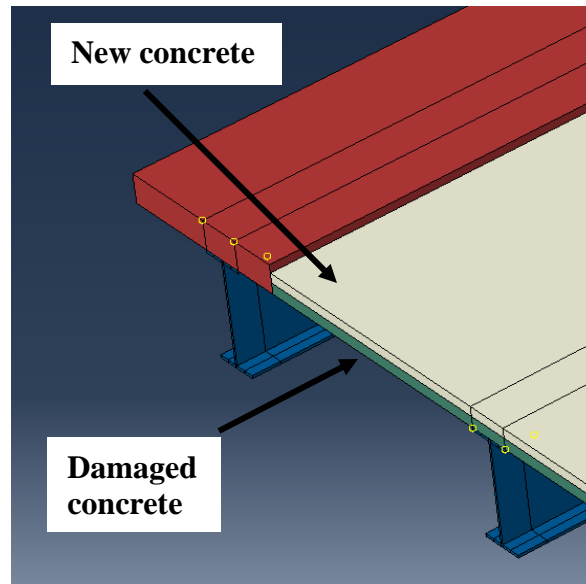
1 New concrete and damaged concrete in ABAQUS interface
